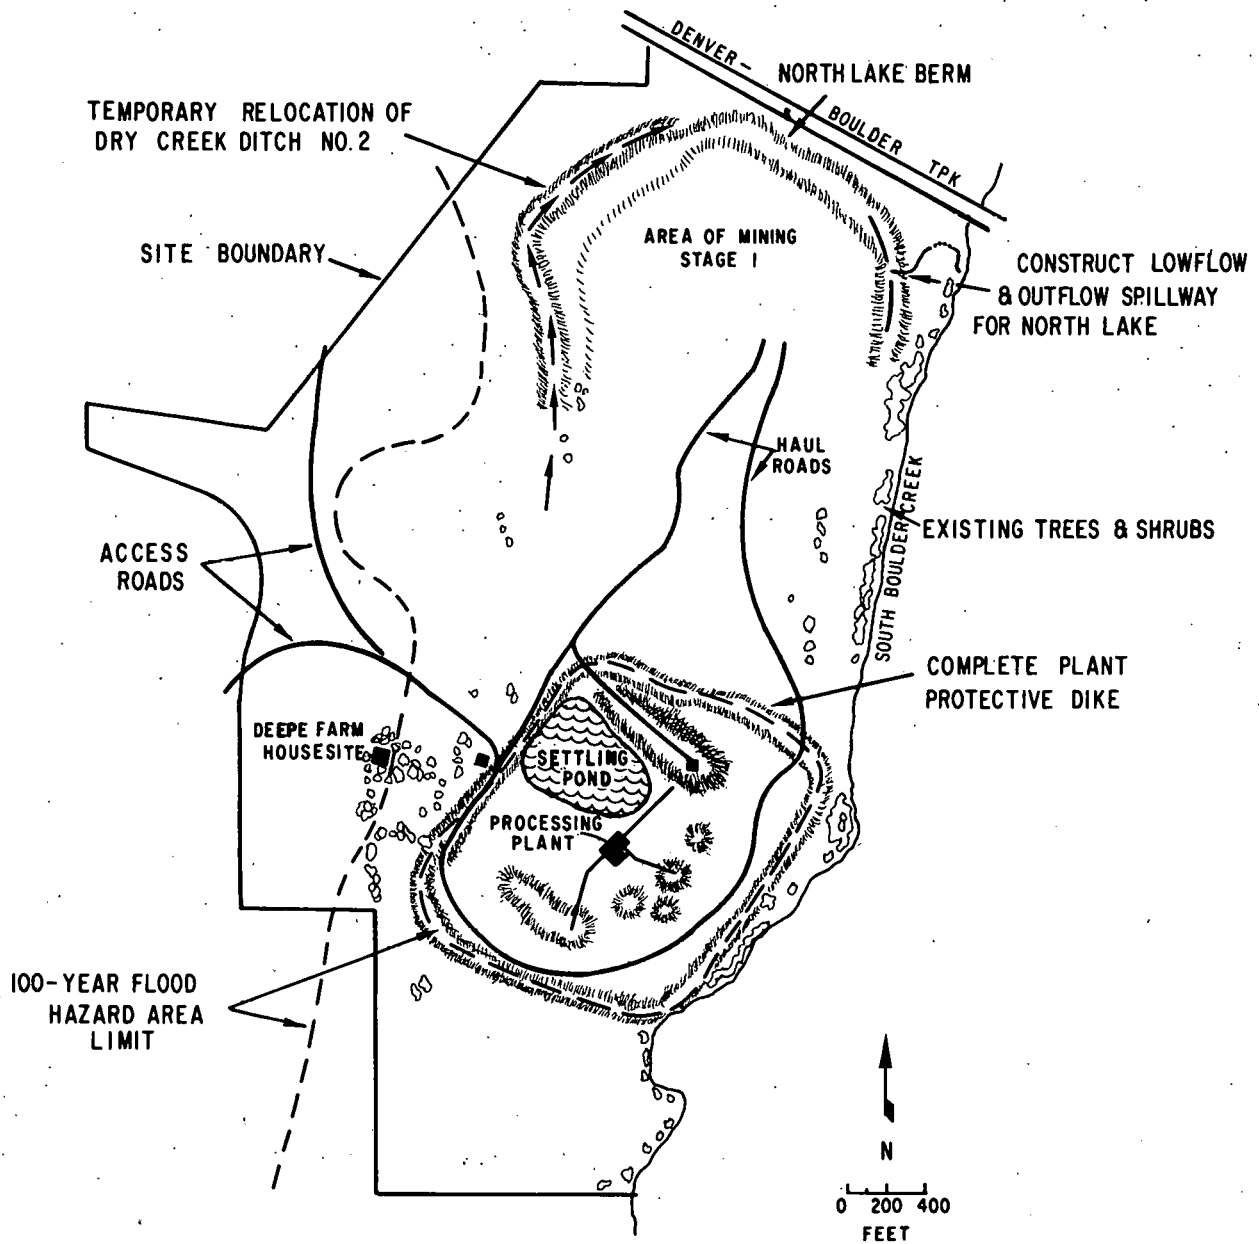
Mining/Reclamation Stage 1, South Boulder Creek Park Project (after EIA, 1975)
